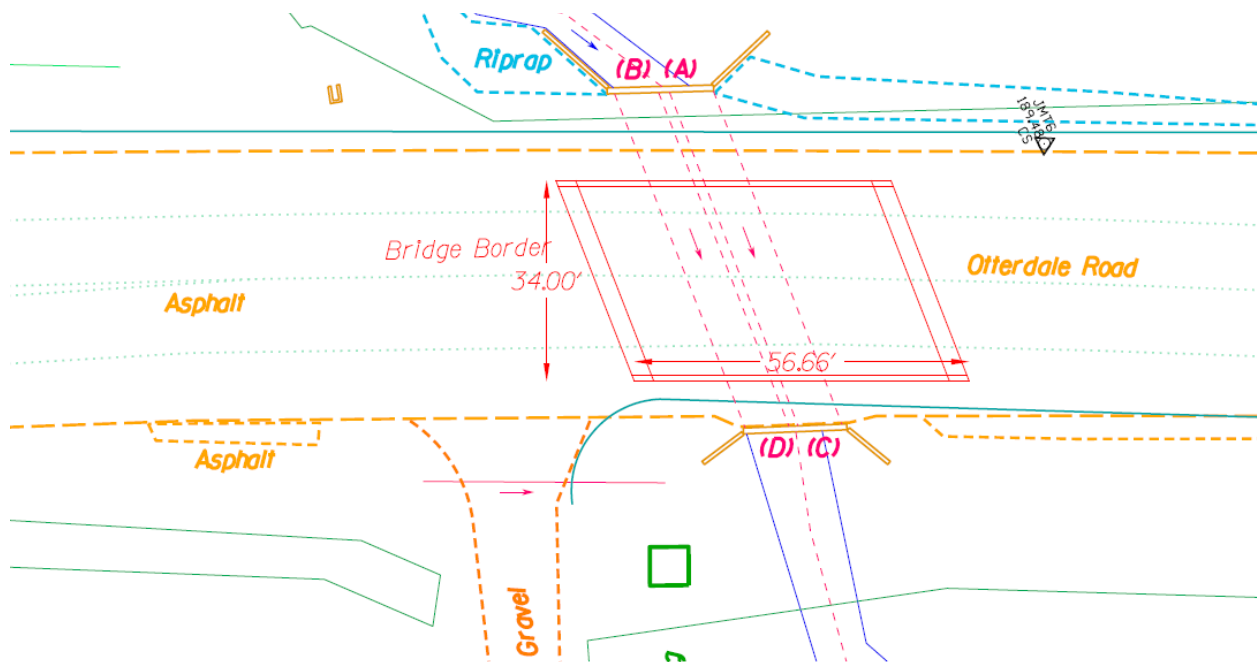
Outline of Proposed Bridge Relative to Existing Roadway in OpenRoads
